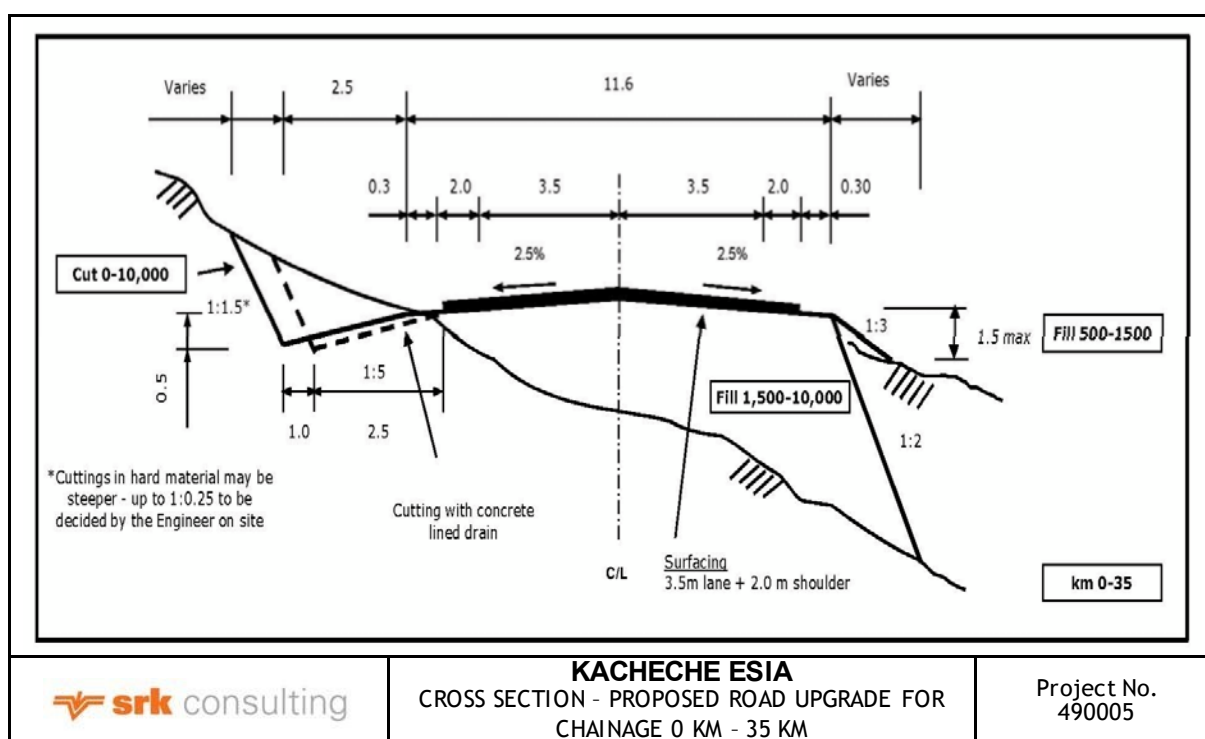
Typical cross section of the proposed road upgrade for chainage 0 km – 35 km
